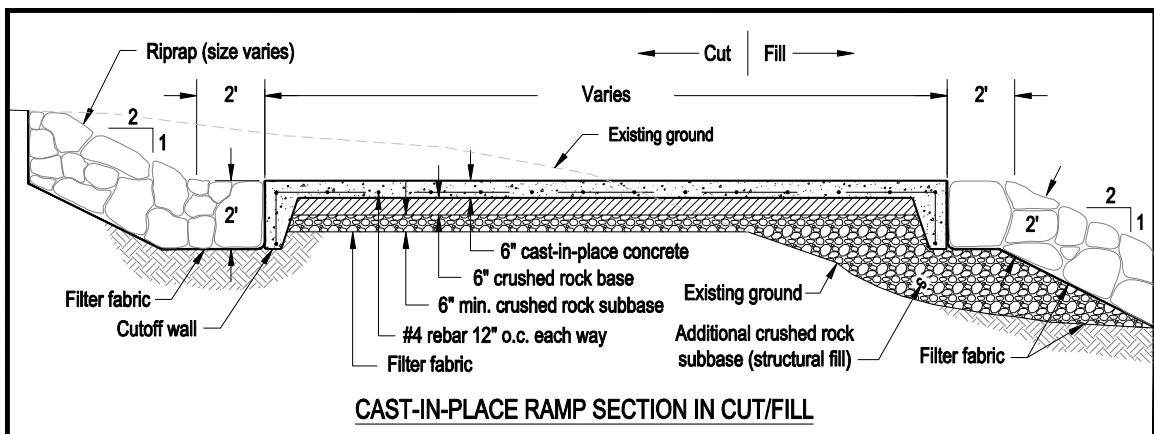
Cast-in-place ramp section in a cut and/or fill situation
